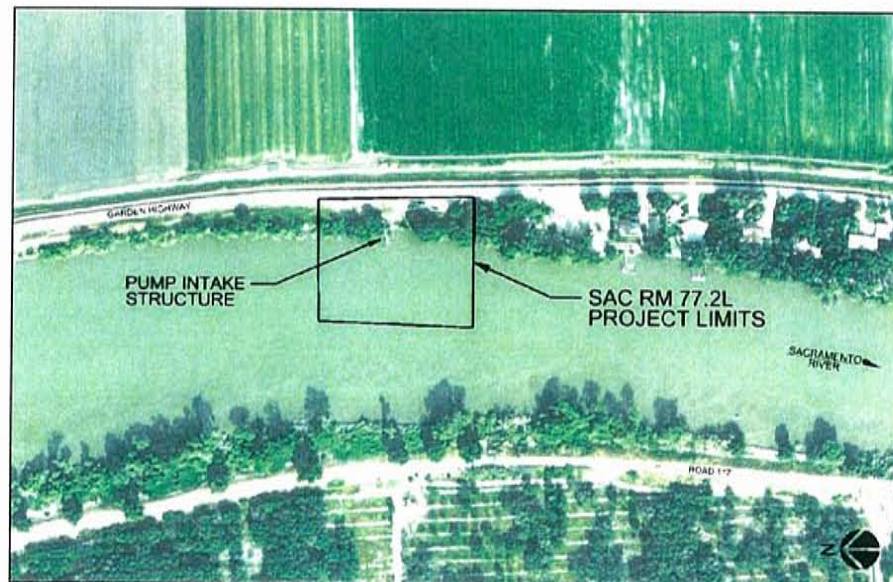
Plan view of the erosion site at SAC RM 77.2L.
